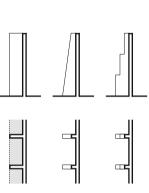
Walls reinforced with ribs, sections (top) and plans (bottom) for increasing the inherent stability
